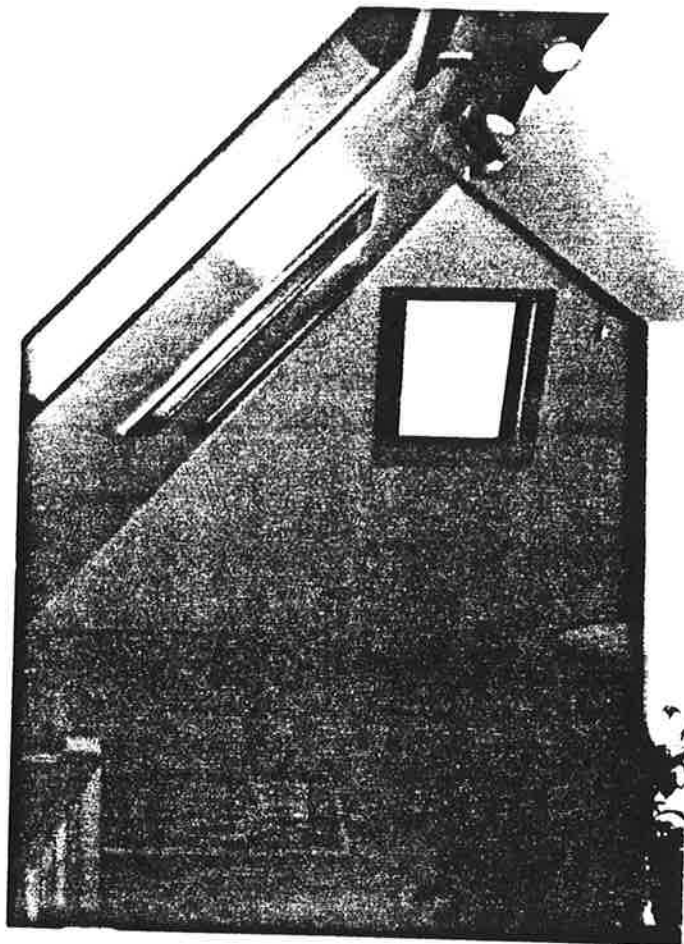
/- Upstairs bedroom addition with skylights at 390.F Street.
